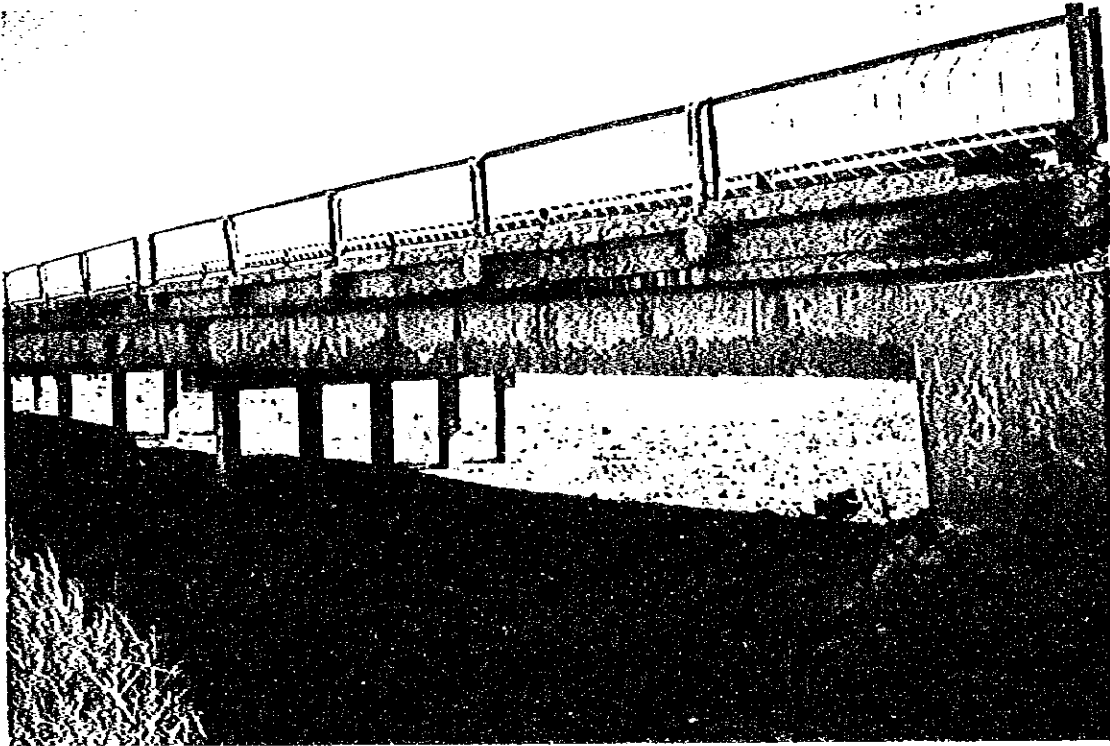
Bridge No. 2 (Atyrau to Mahambet)
